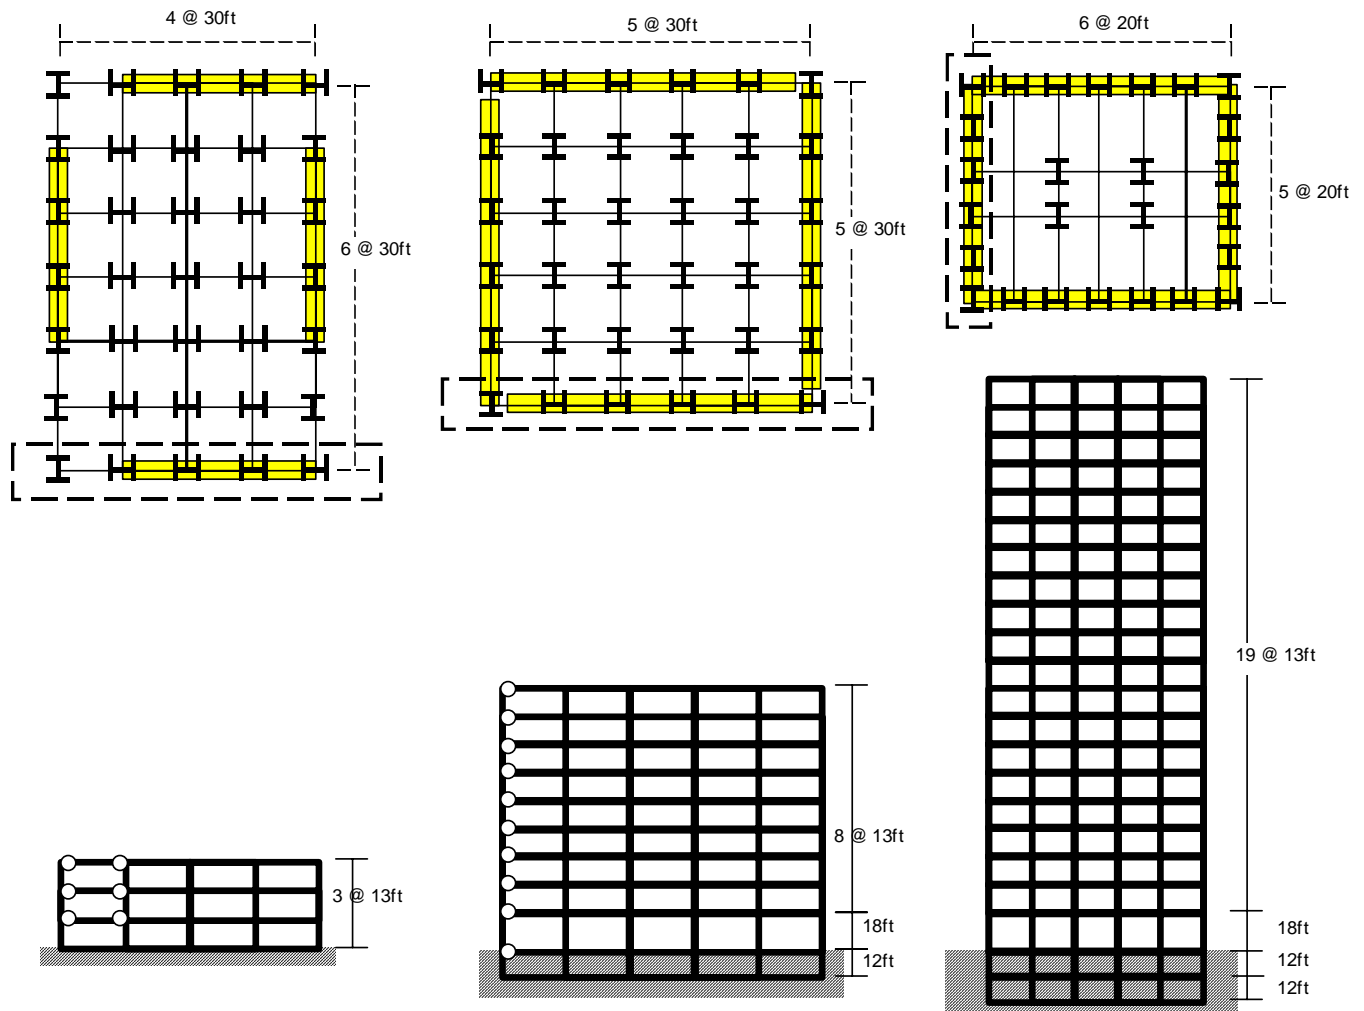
Floor Plans and Elevations for the Pre-Northridge Buildings
